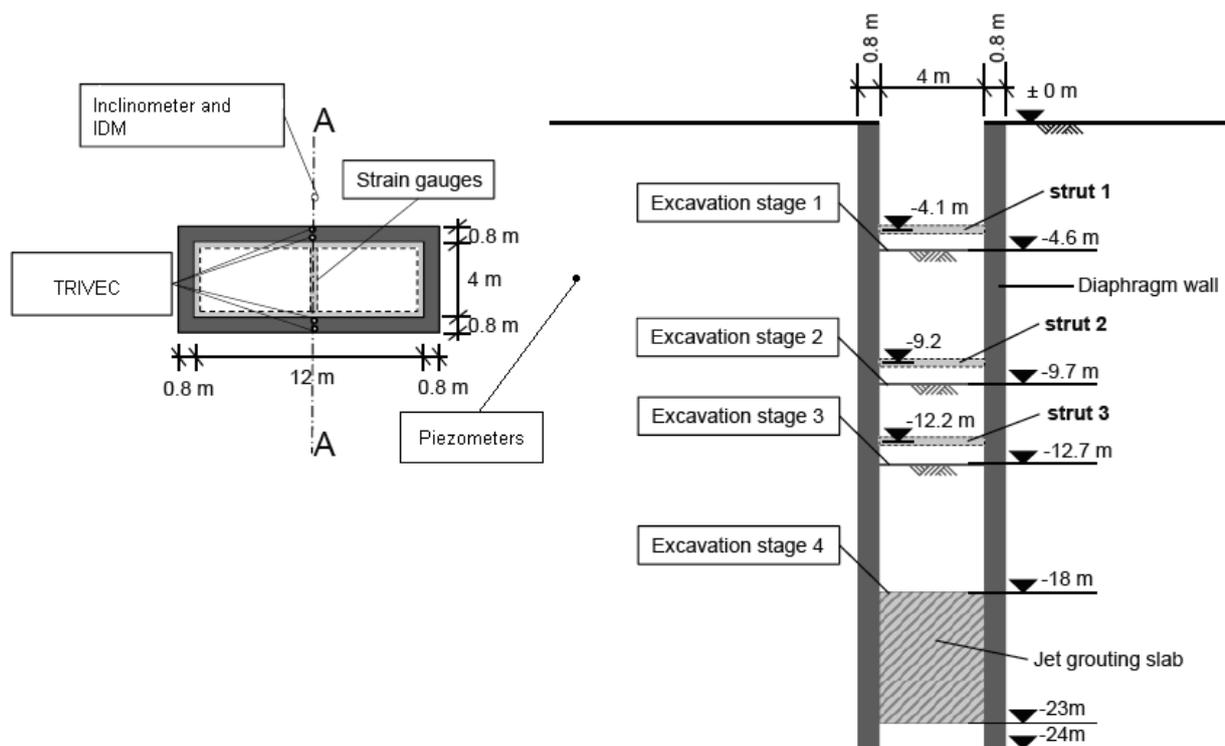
Plan view and cross-section of the test shaft indicating the depth of the struts and excavation stages as well as the installed instrumentation
